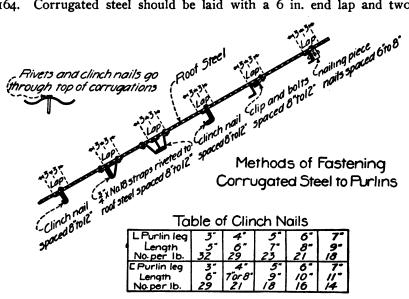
Methods of Fastening Corrugated Steel to Purlins and Girts.
